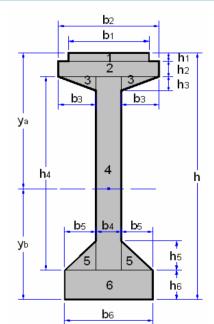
Section Properties of Prestressed Beams (PCI girder) Source: WIKA's Concrete Catalogue
